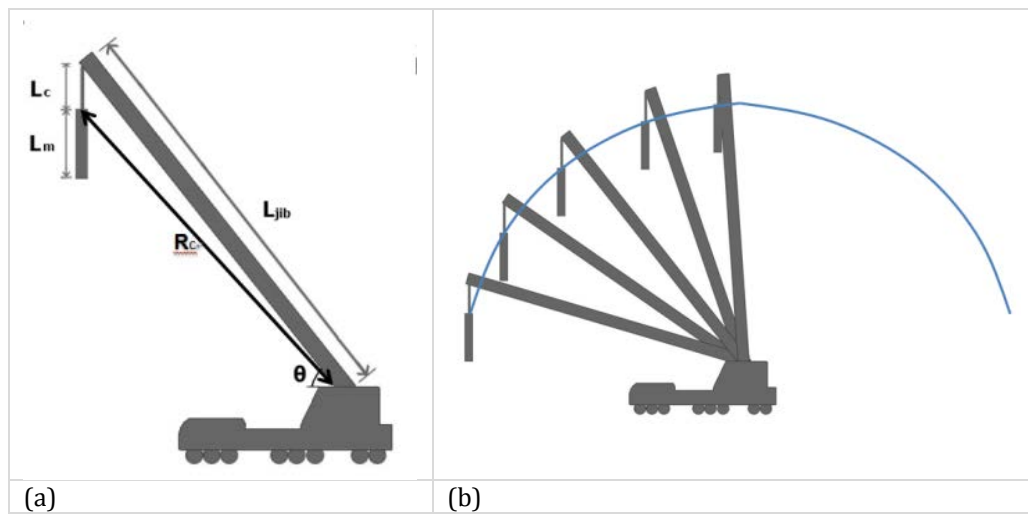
(a) Workable radius when hanging a structural column (b) workable semi-sphere when hanging a structural column
